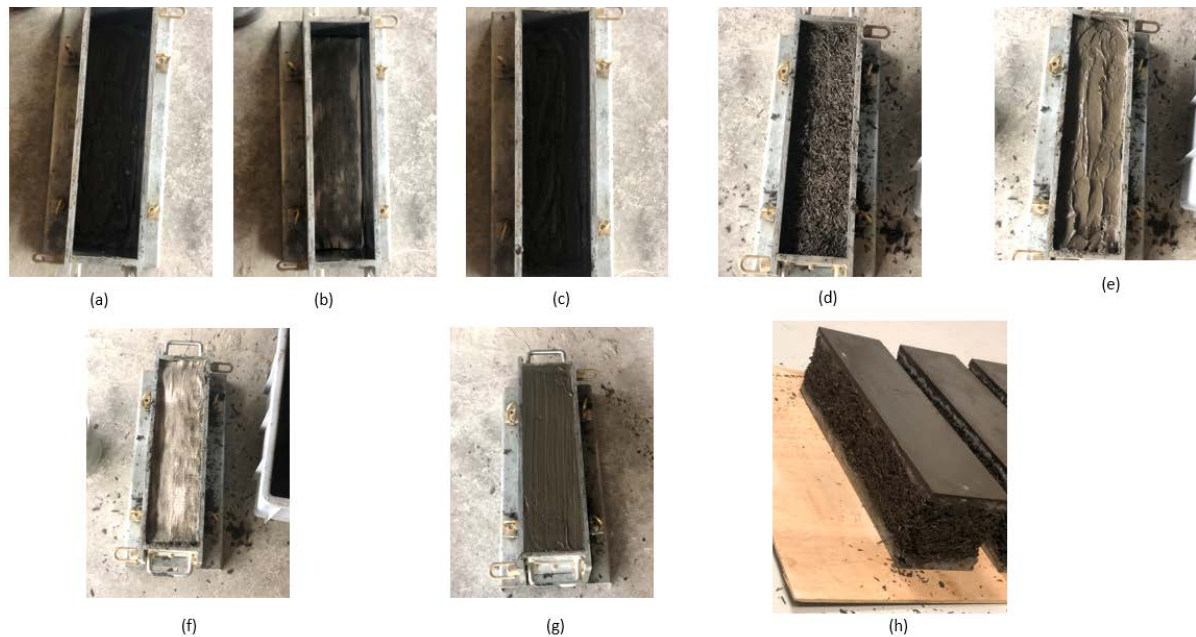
Process of hemp concrete design for bending specimens; (a): dropping of hemp shives, (b): wetting of hemp shives, (c): put on CSA cement, (d): hand mixing of hemp shives with water and cement, (e): status of the resulting mixture, (f): compaction loads on hemp concrete inside the molds, (g): demolded hemp concrete in the case of the parallelepiped molds, (h): demolded hemp concrete in the case of the cylindrical specimens.
